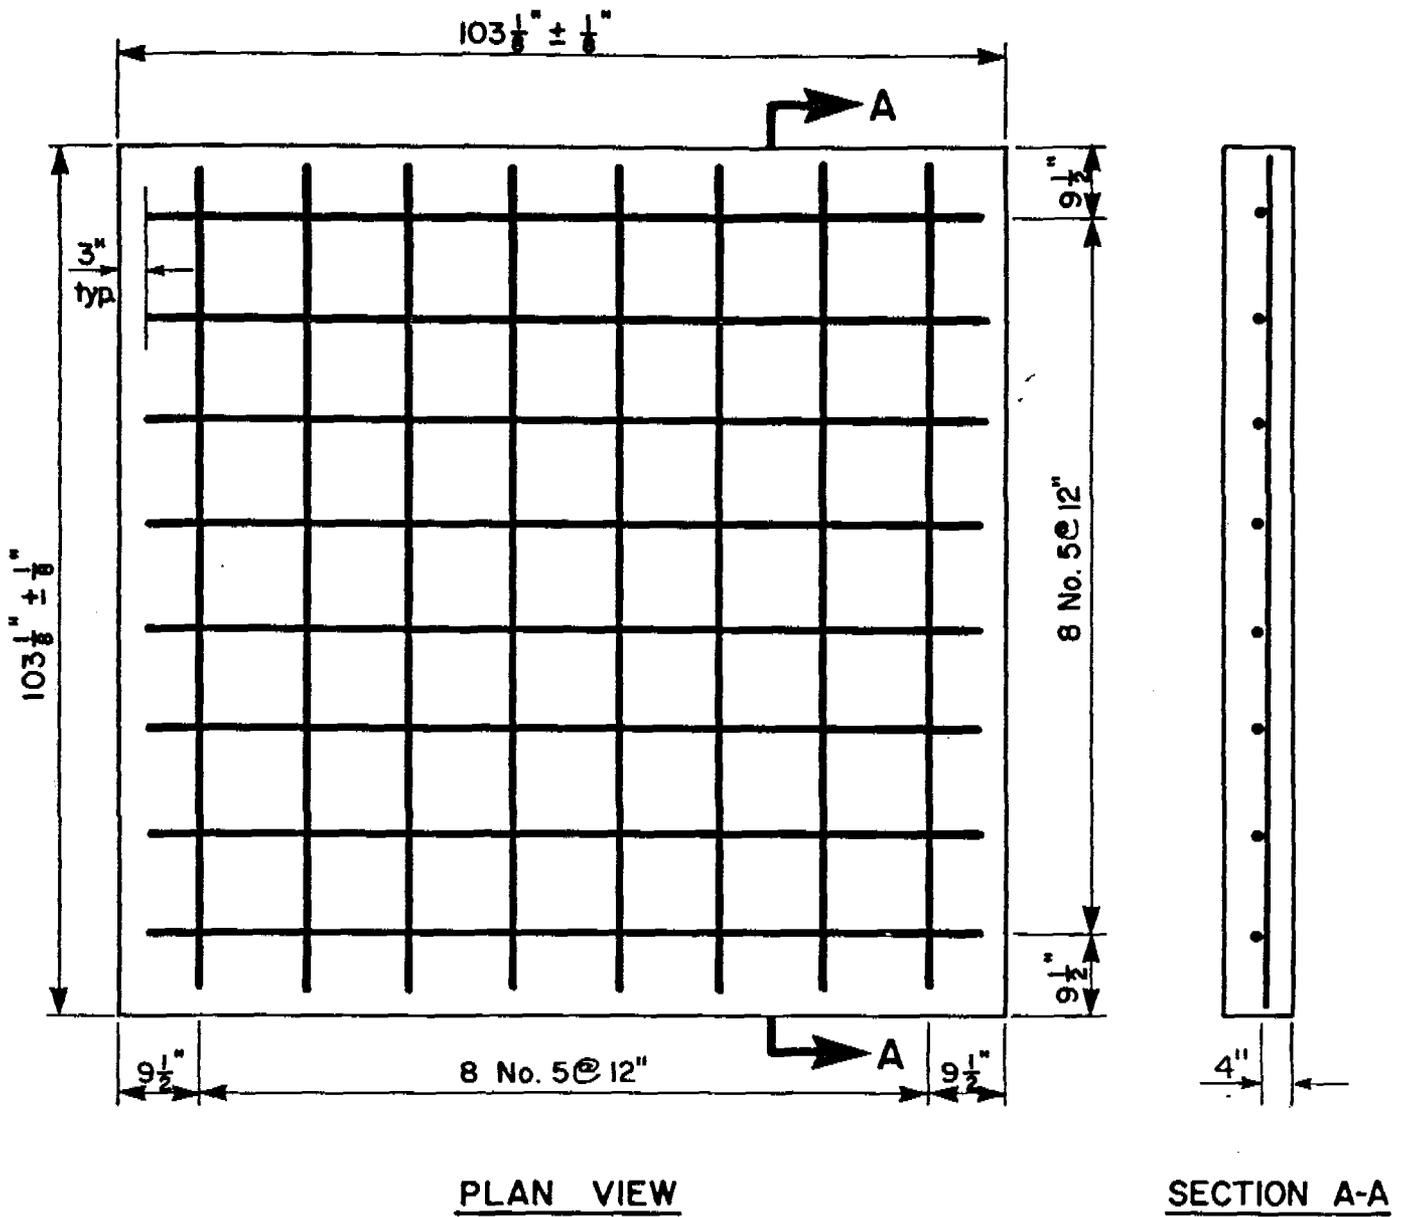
Reinforcement Details for Normal-Weight Concrete Wall C1
